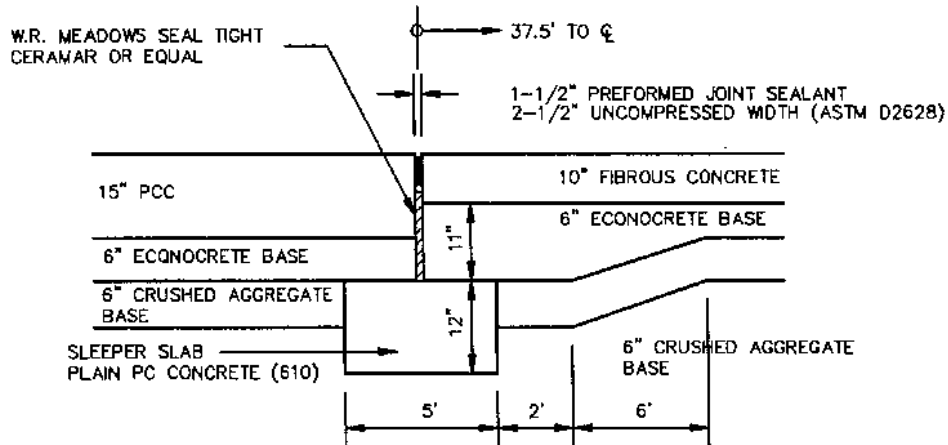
DETAIL OF GAP SLAB BETWEEN THE PRESTRESSED FIBROUS PCC PAVEMENT WITH TYPE K CEMENT AND FIBROUS JOINTED PCC PAVEMENT WITH TYPE K CEMENT
